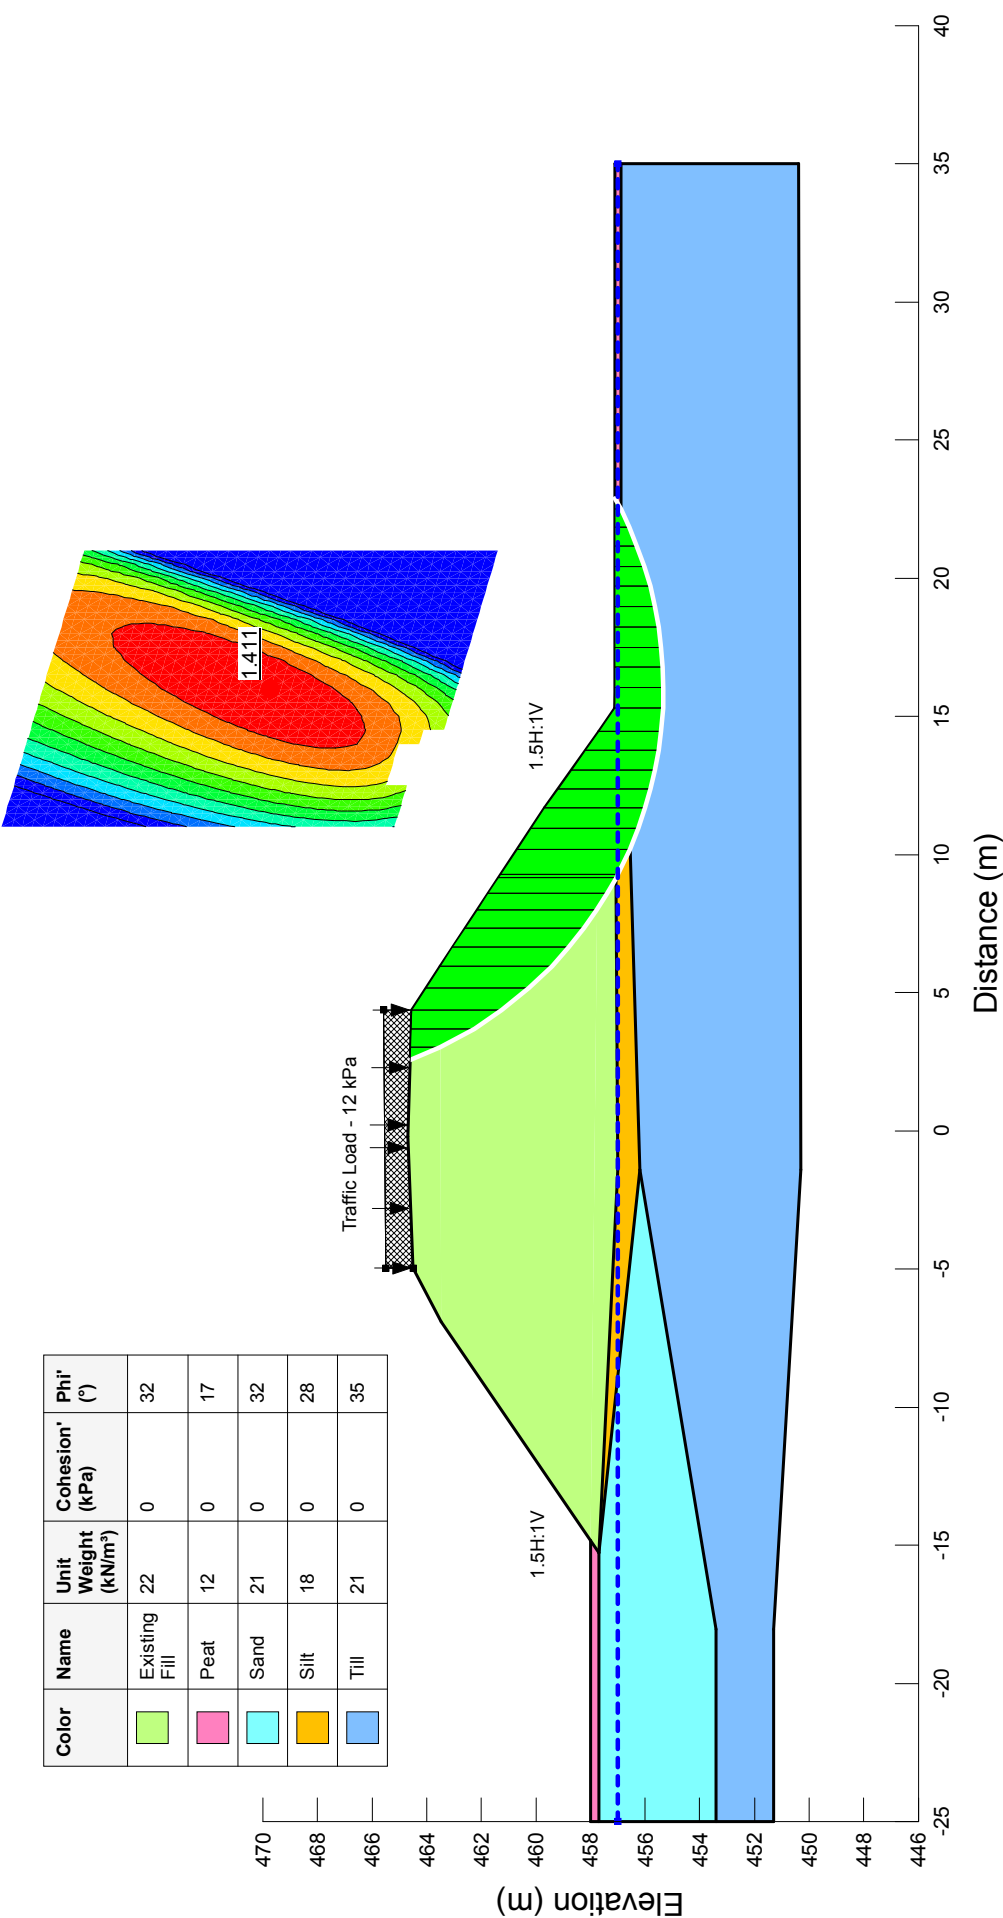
Existing Embankment Stability - Stn. 19+950
